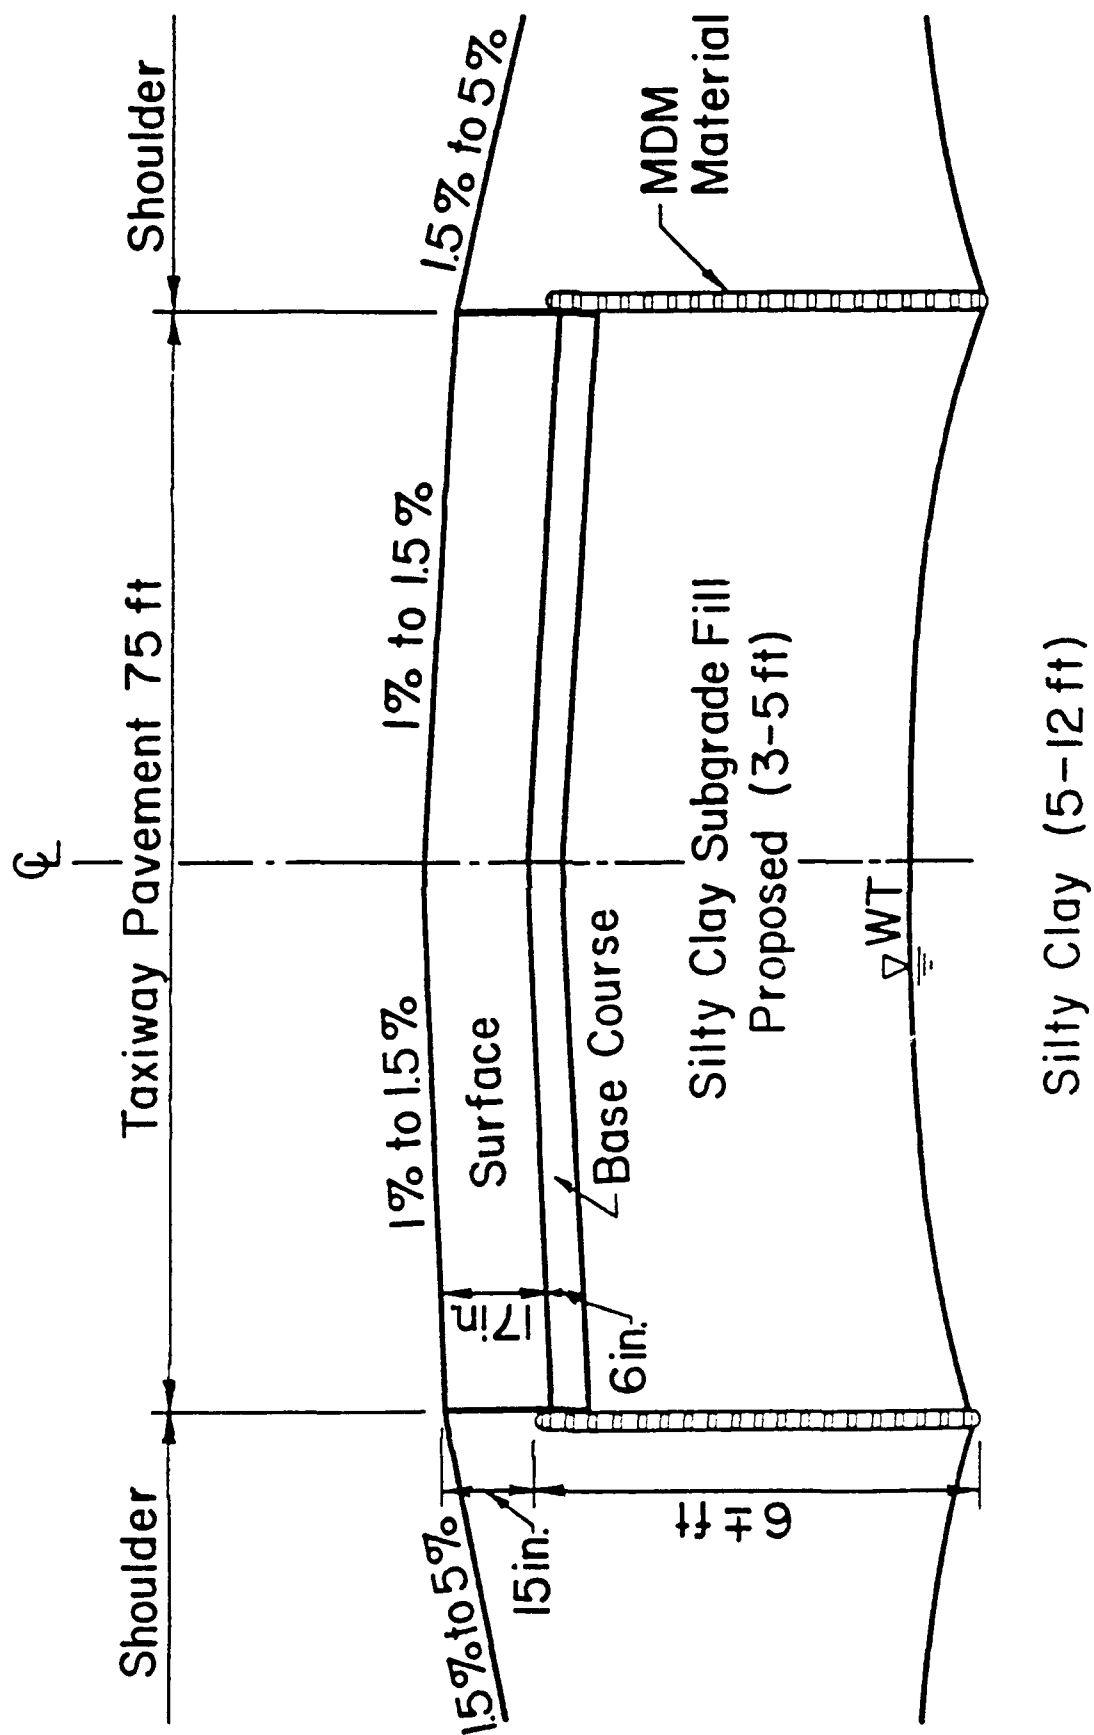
A PGS System which Provides Both Structural Pavement Drainage and Water Table Depth Control.
